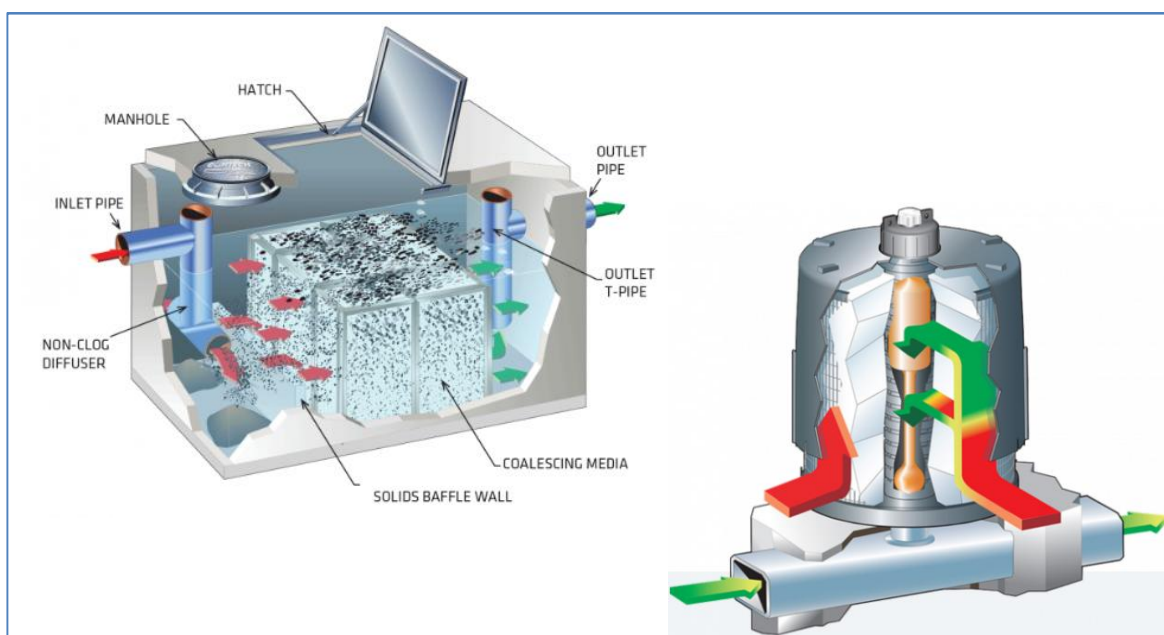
Stormwater360 Examples - Oil-Water separator and Stormfilter
